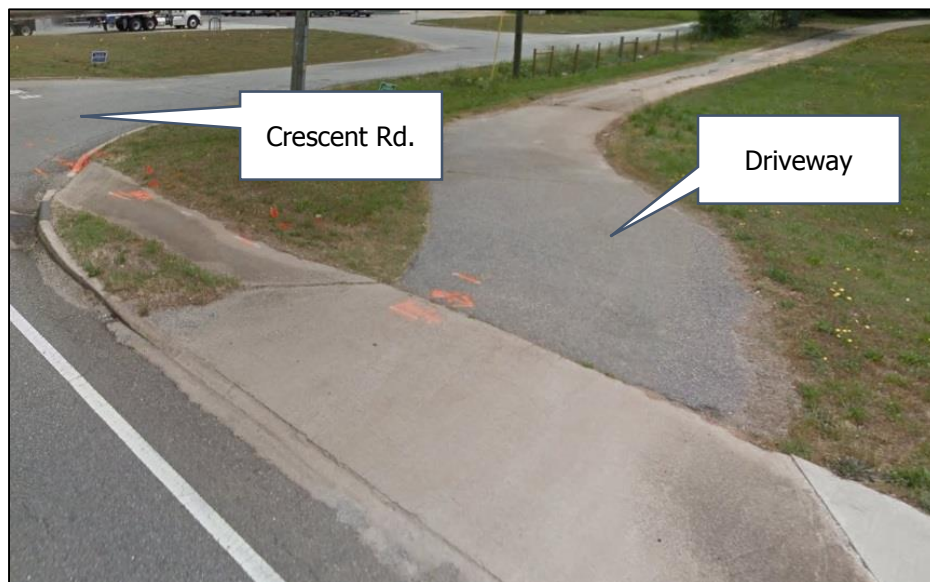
DRIVEWAY TOO CLOSE TO INTERSECTION AT CRESCENT ROAD.
